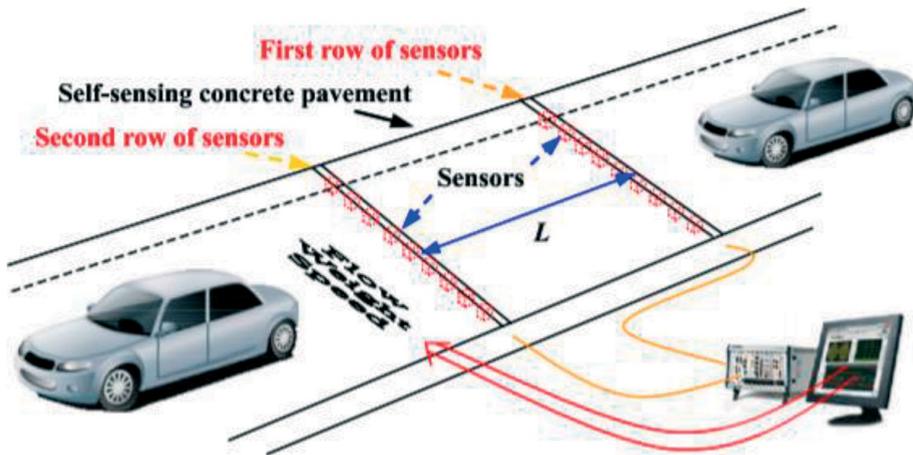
Traffic tracking on self-sensing concrete pavement (38)
